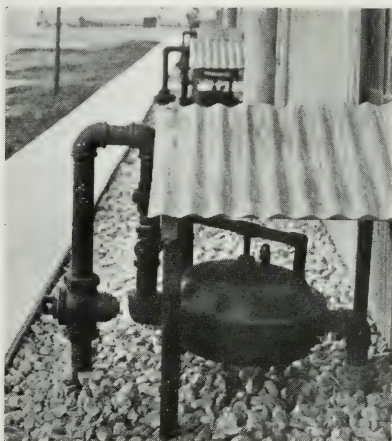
SENSITIVE REGULATOR ON SUPPLY LINE TO GAS ENGINE
